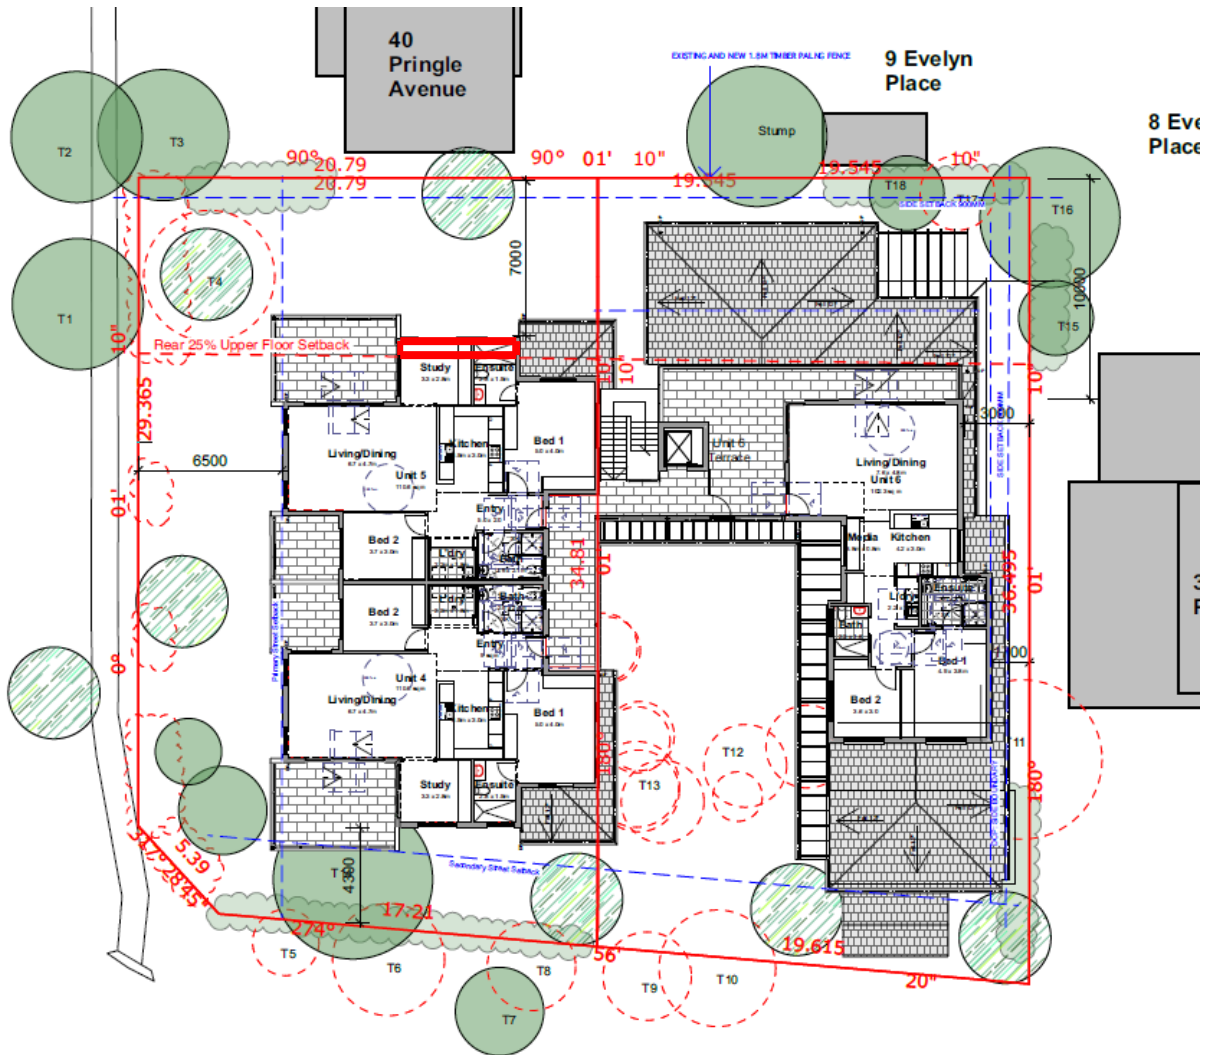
First floor rear 25% site area single storey breaching elements in plan
